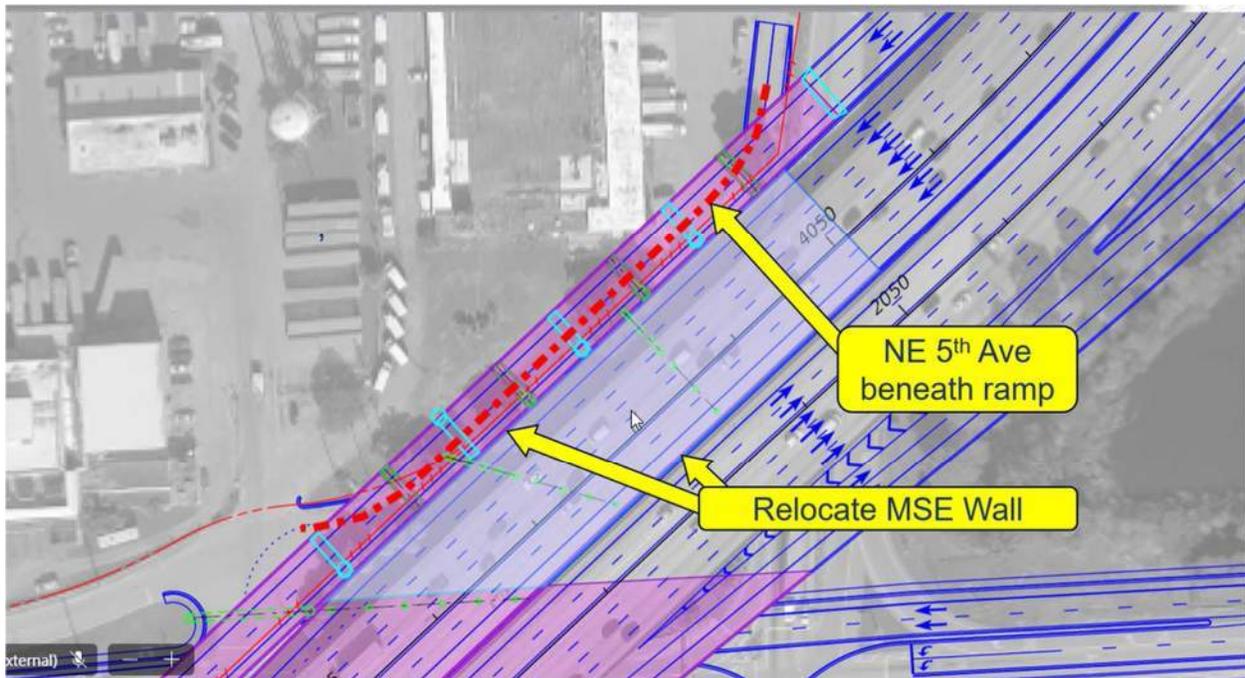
VE Proposed Bridge Configuration at MGD and I-95 Intersection
